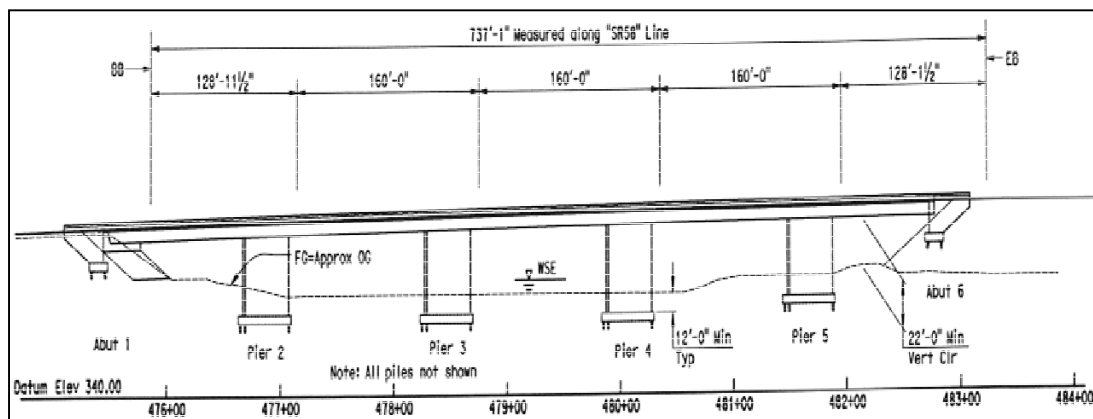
Profile of Bridge Widening over the Kern River (Alternative C)
